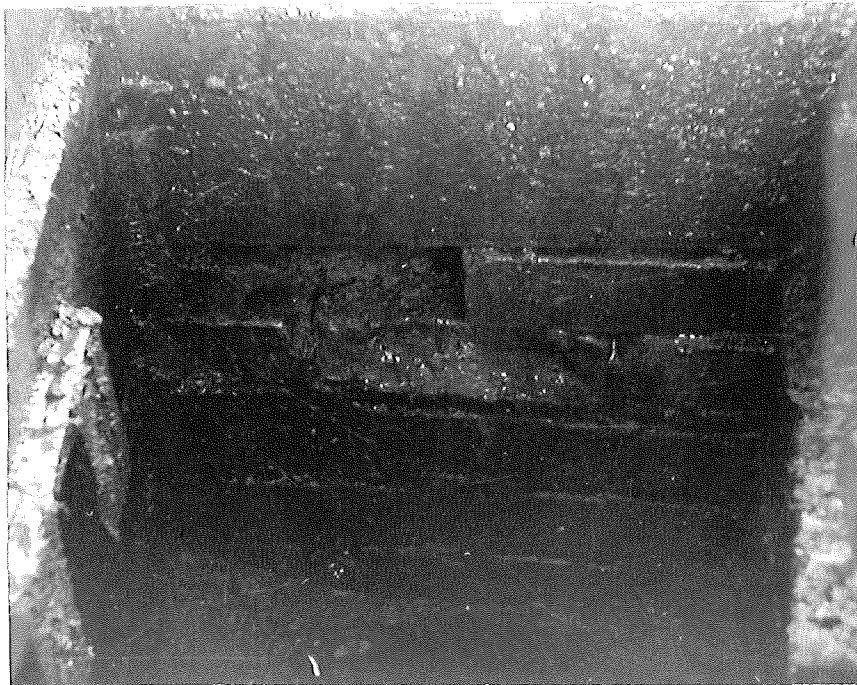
Brick failure by spalling in another catch basin at Pelham Drive and Wabash R.R. grade separation. Daniels Brick. Only two bricks in catch basin have spalled. Age 7 years.
